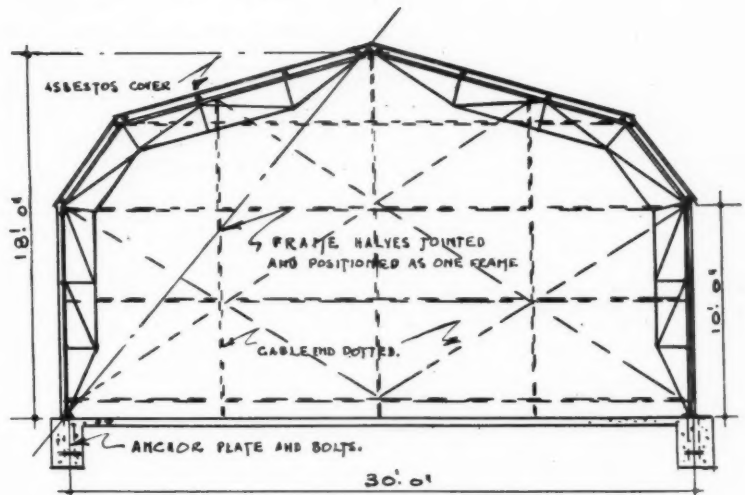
Light tubular construction incorporating composite roof truss and tubular columns.
